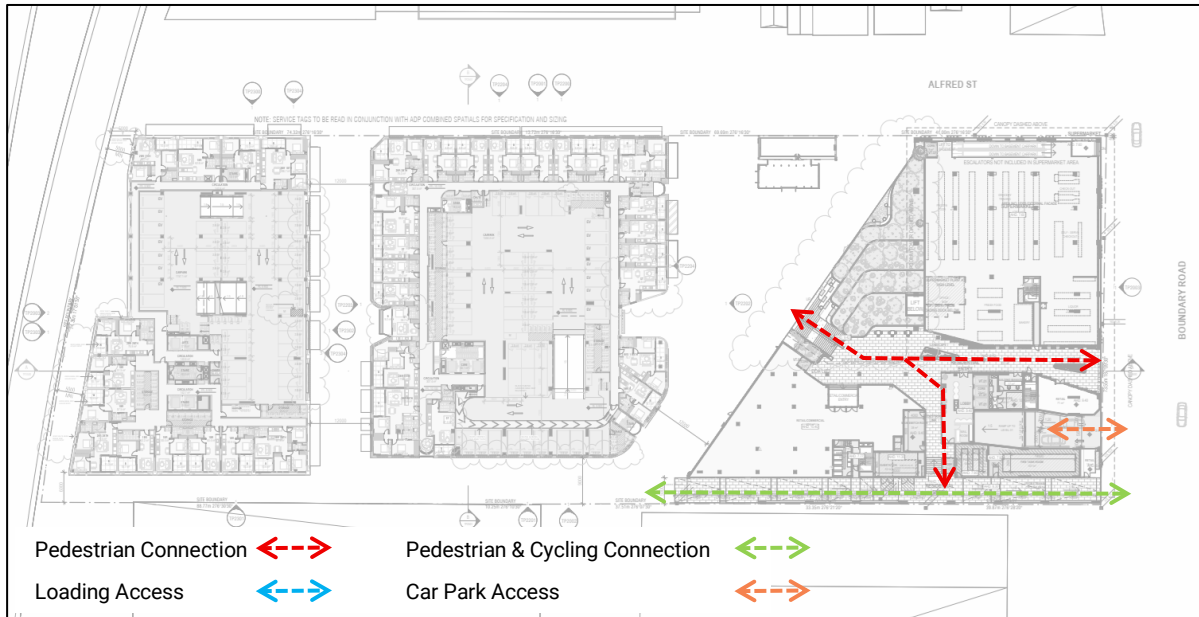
Proposed Site-Specific Vehicular Access Arrangements – Upper Ground
